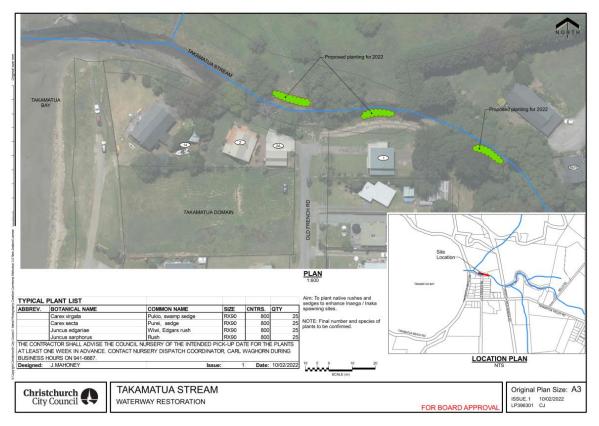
Proposed Takamatua Esplanade Reserve Landscape Plan.
